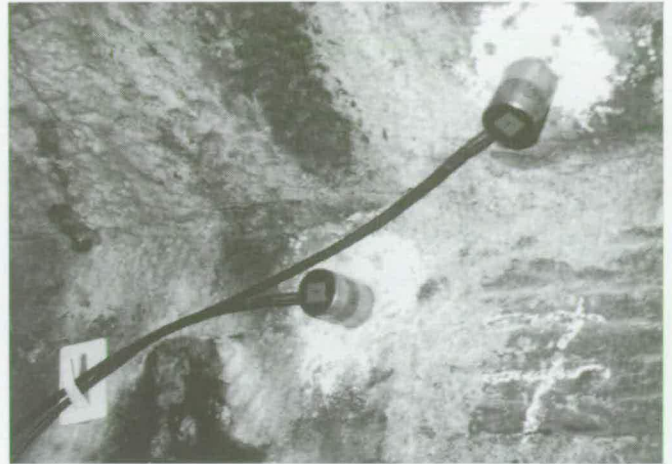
Close-up of sensors mounted on arch and spring wall.
